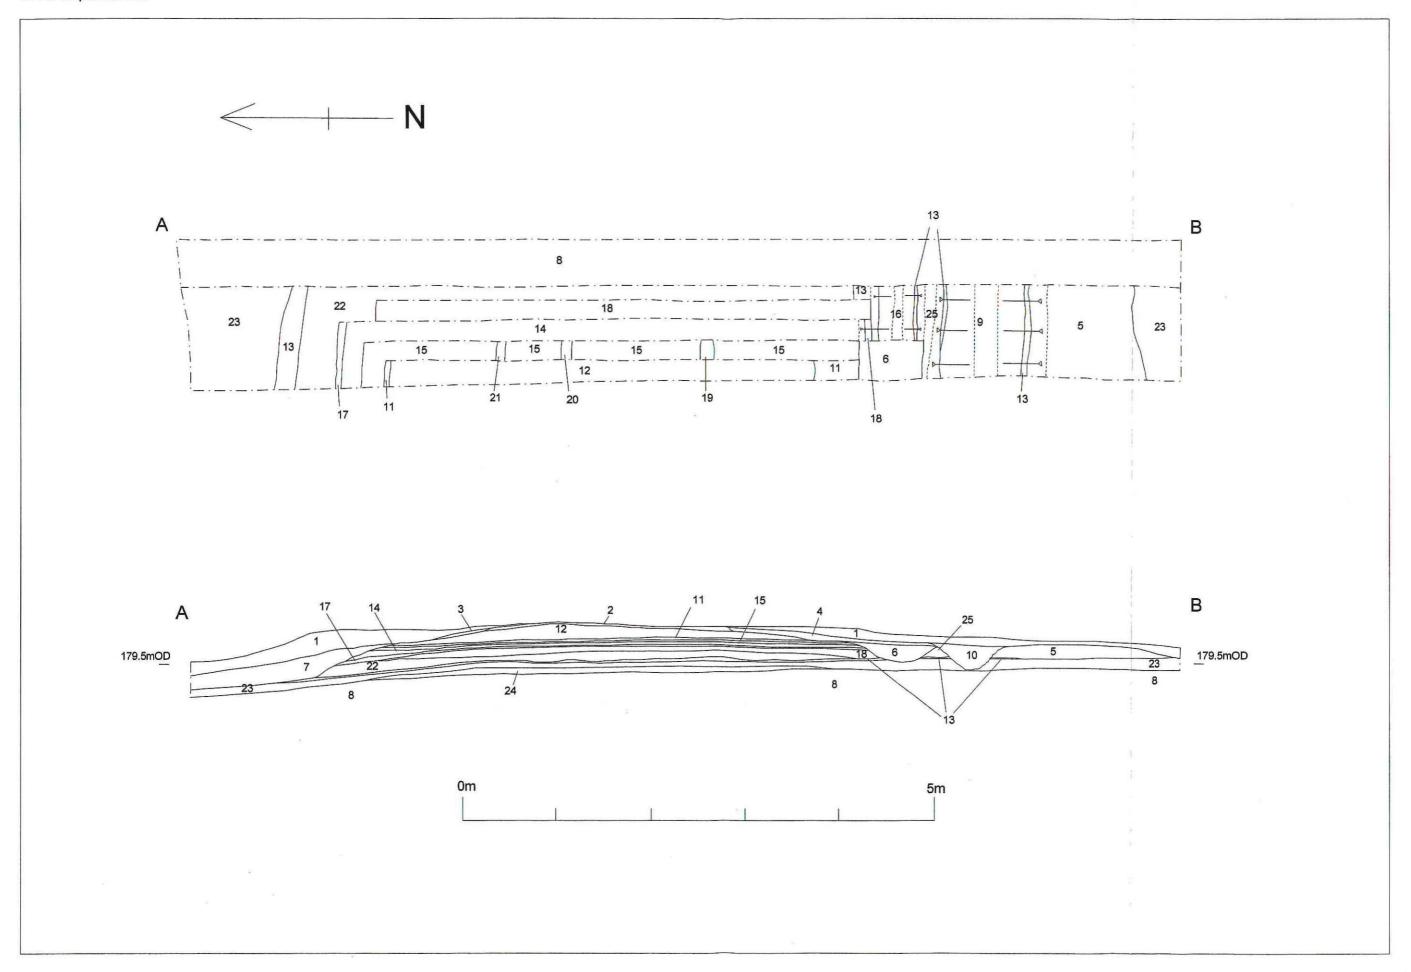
Plan and section of excavation trench crossing Roman road (Scale 1:40)
